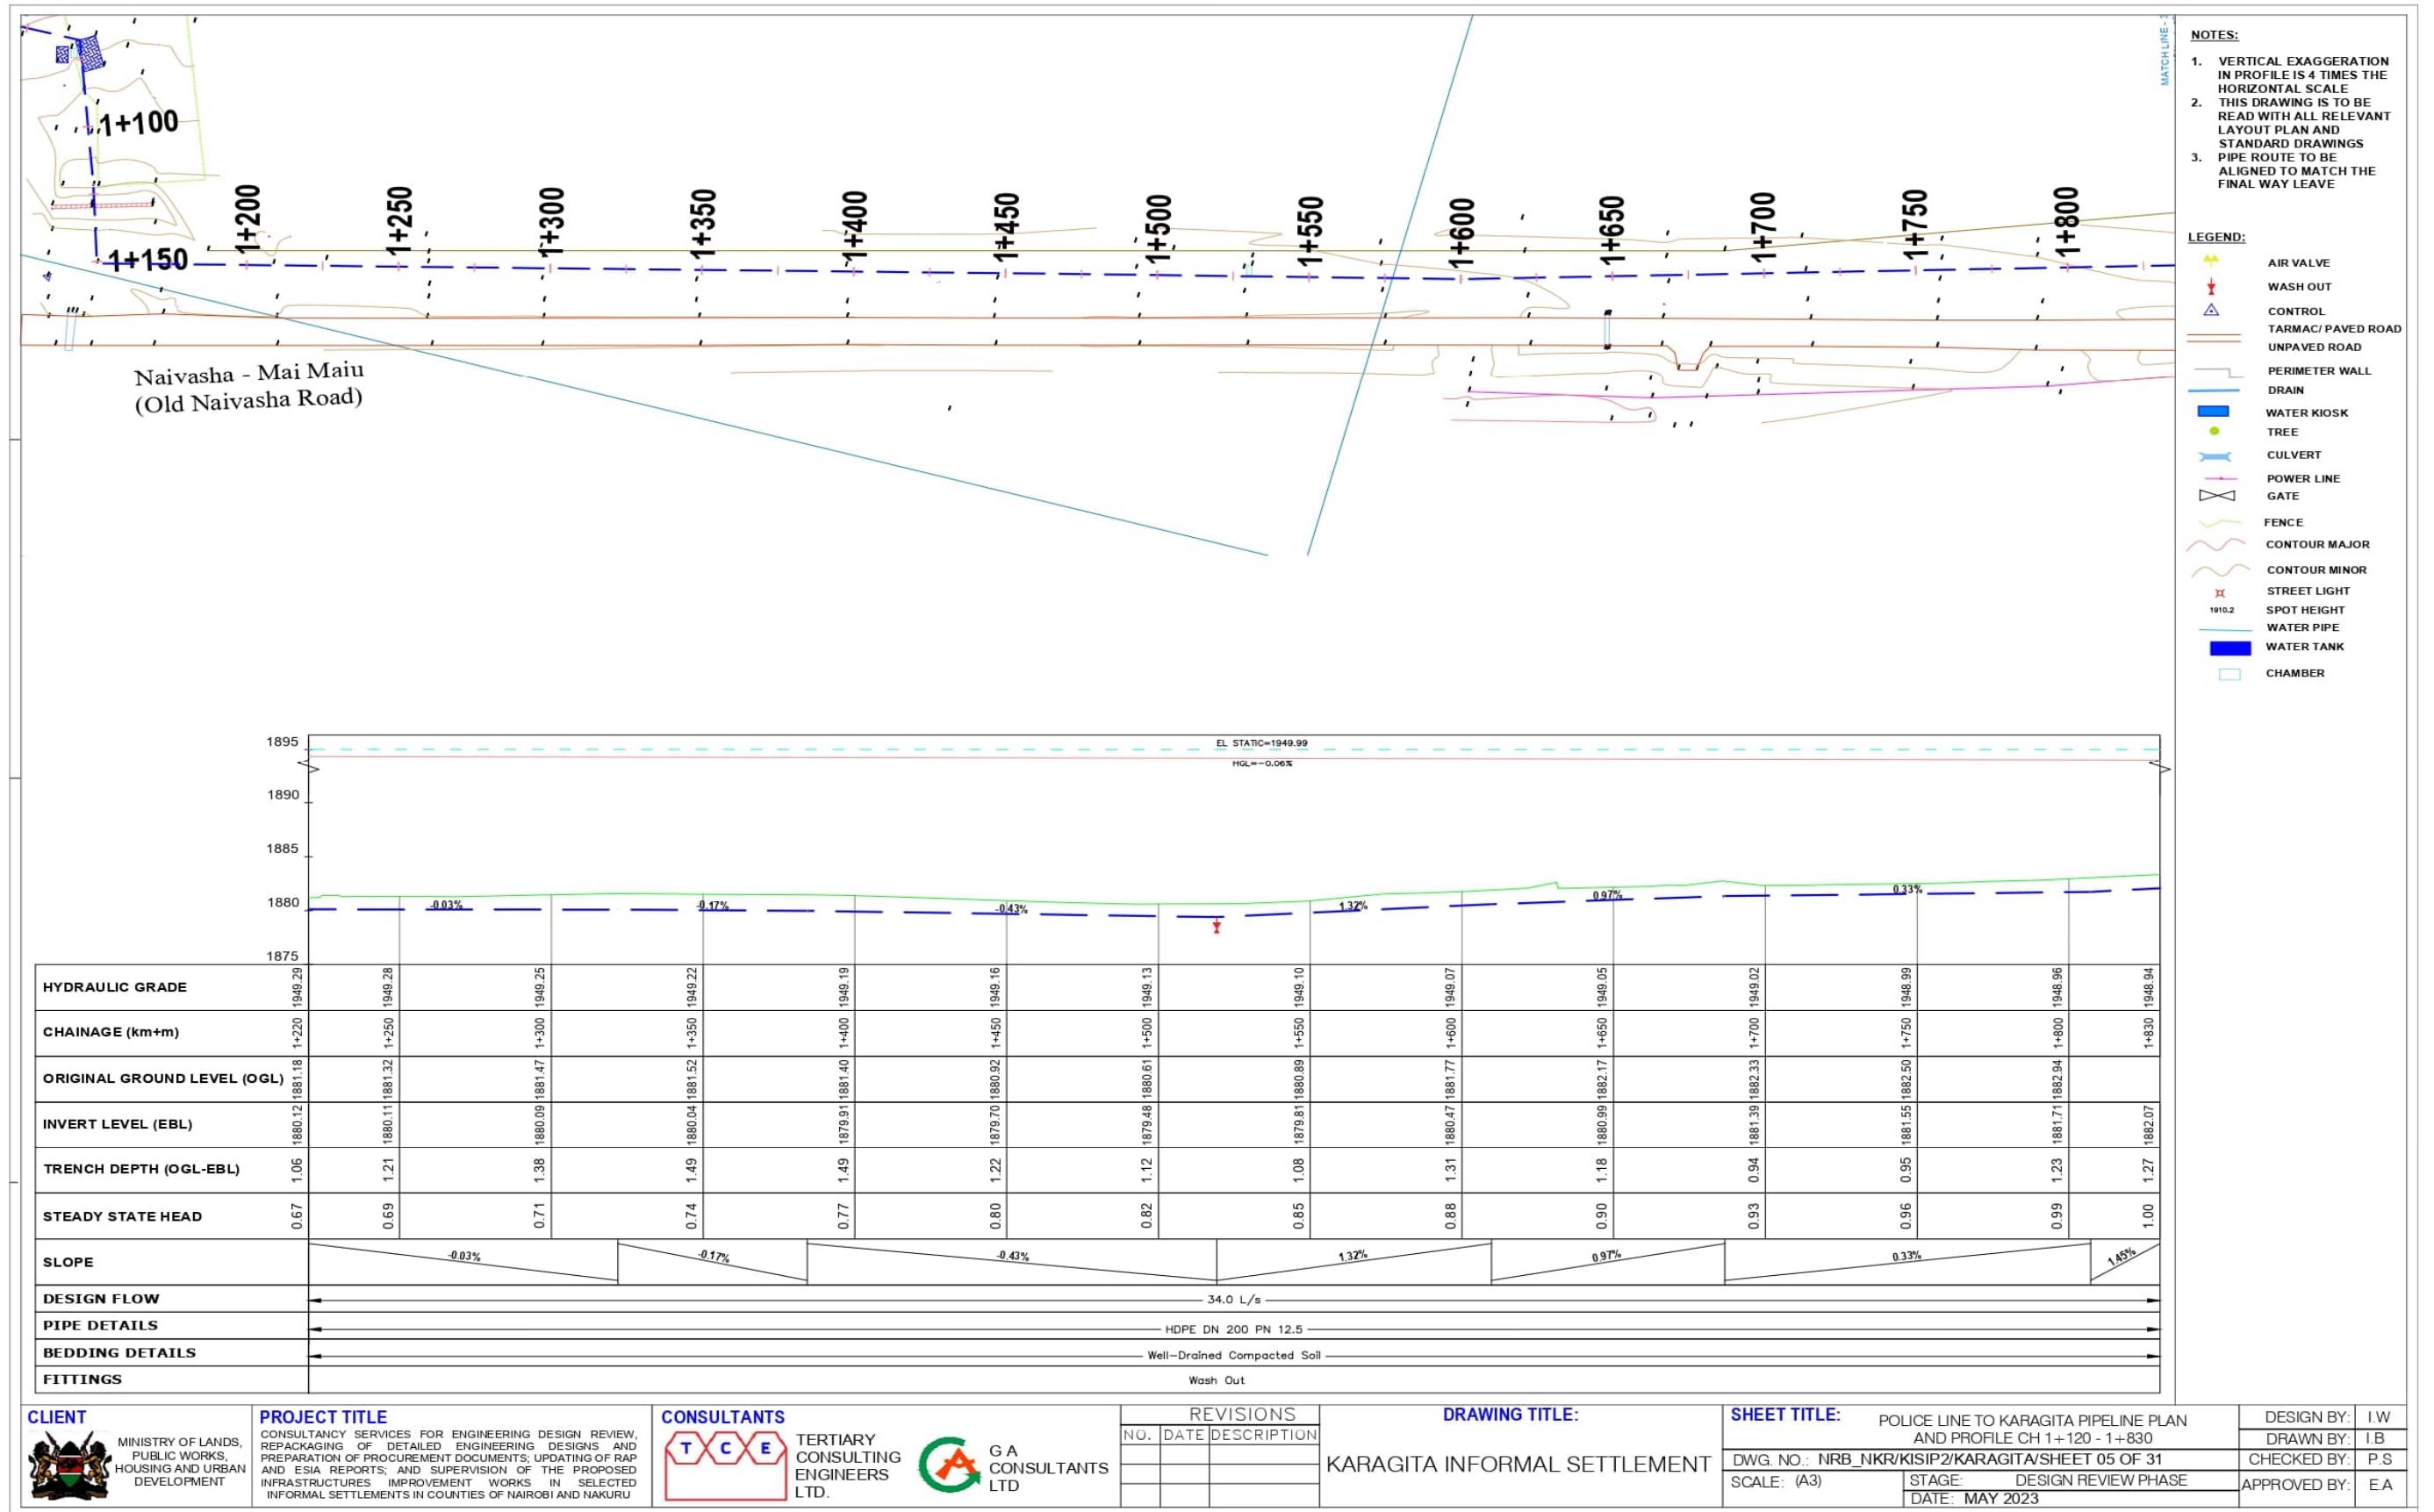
Karagita Design Engineering Layout Plan (1)
